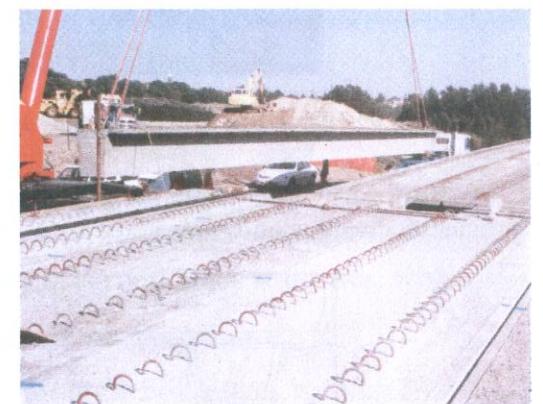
Super Tee beams on the stockyard and during erection, prior to casting of the bridge deck
